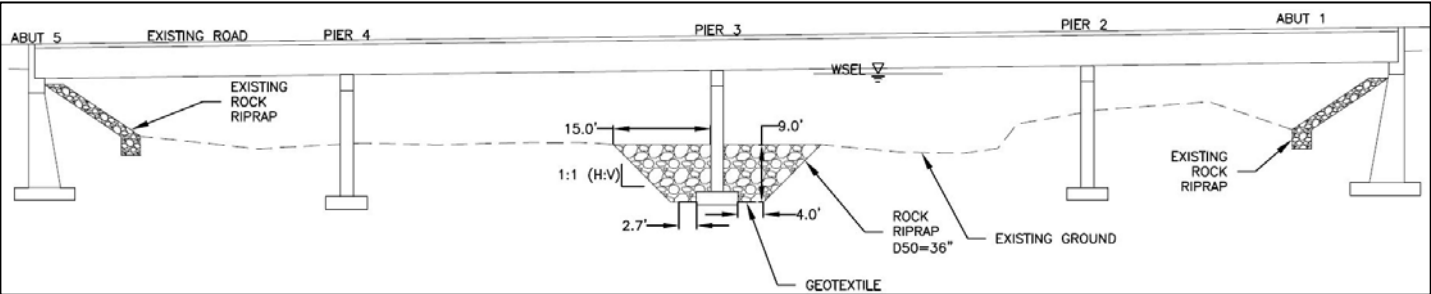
Cross-sectional view of Bridge J-01-C with recommended hydraulic scour countermeasures
